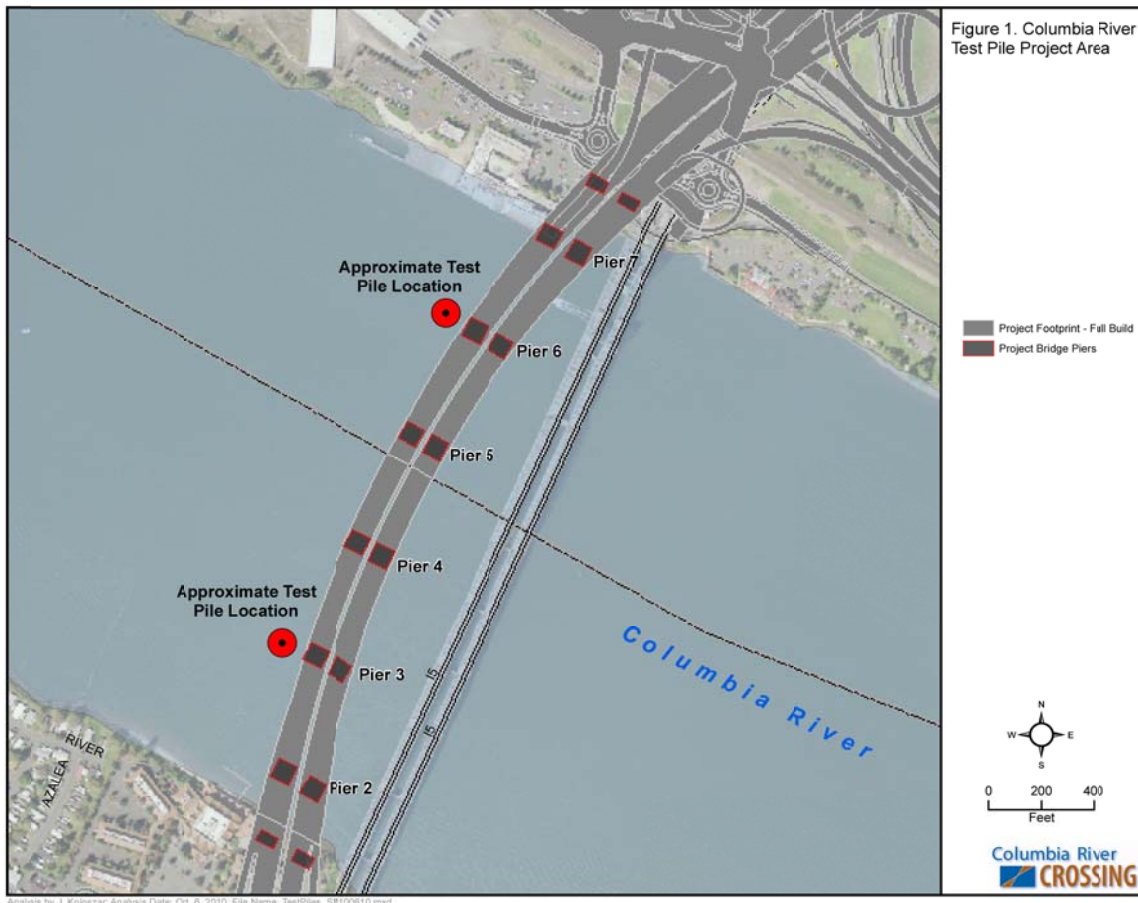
Location of Test Pile Sites at Proposed Piers #3 and #6.
